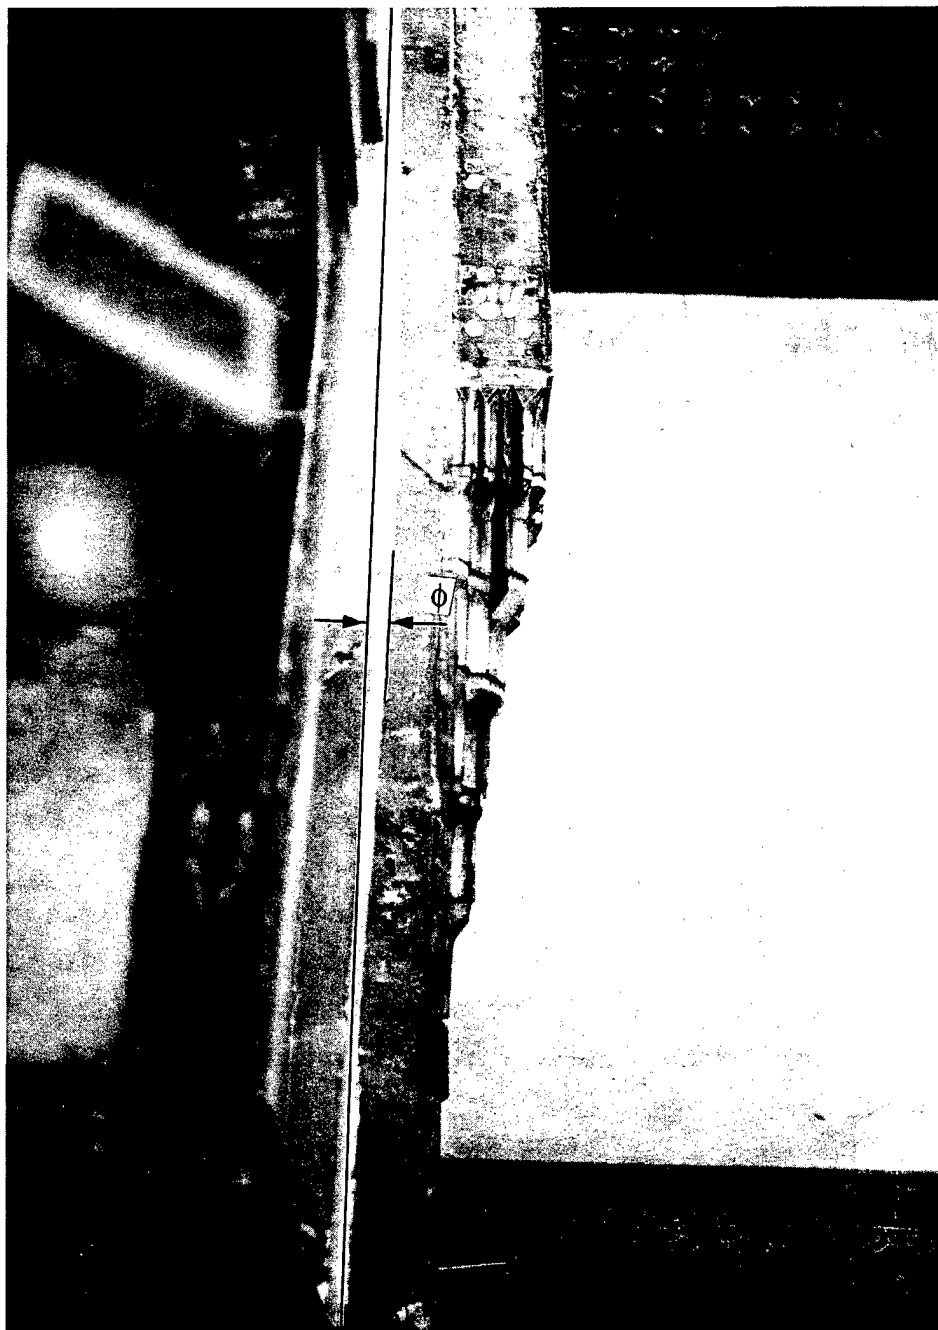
Interior wall and column at Bayt as-Sihaymi showing out-of-plumb column
